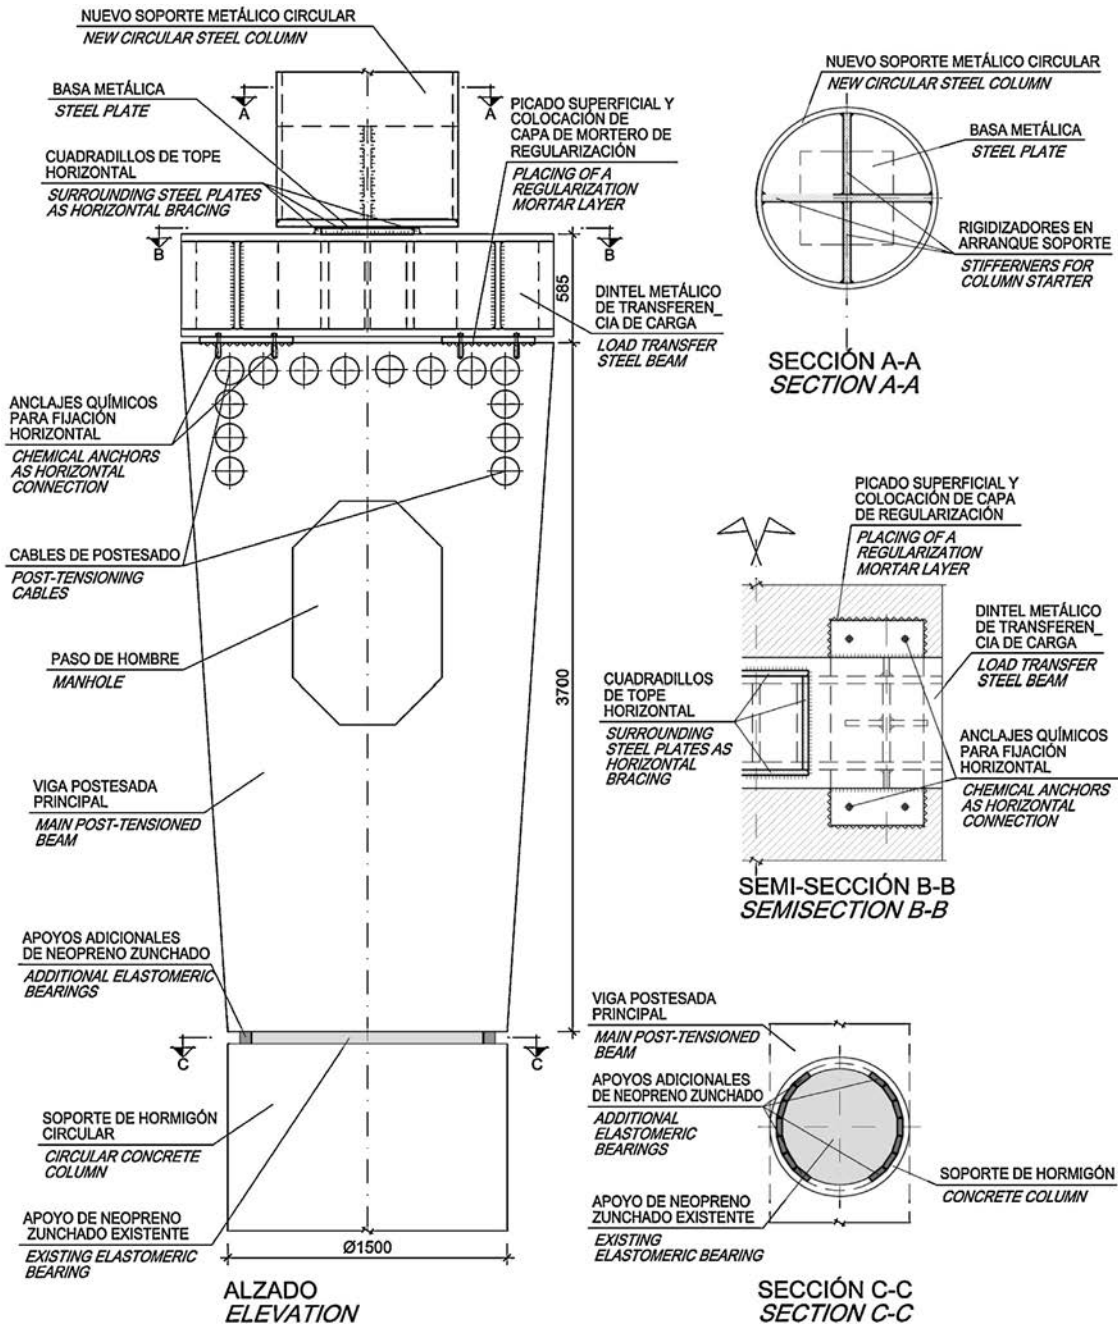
Bearing plate where the steel roof column rests on the post-tensioned beam, detail.
